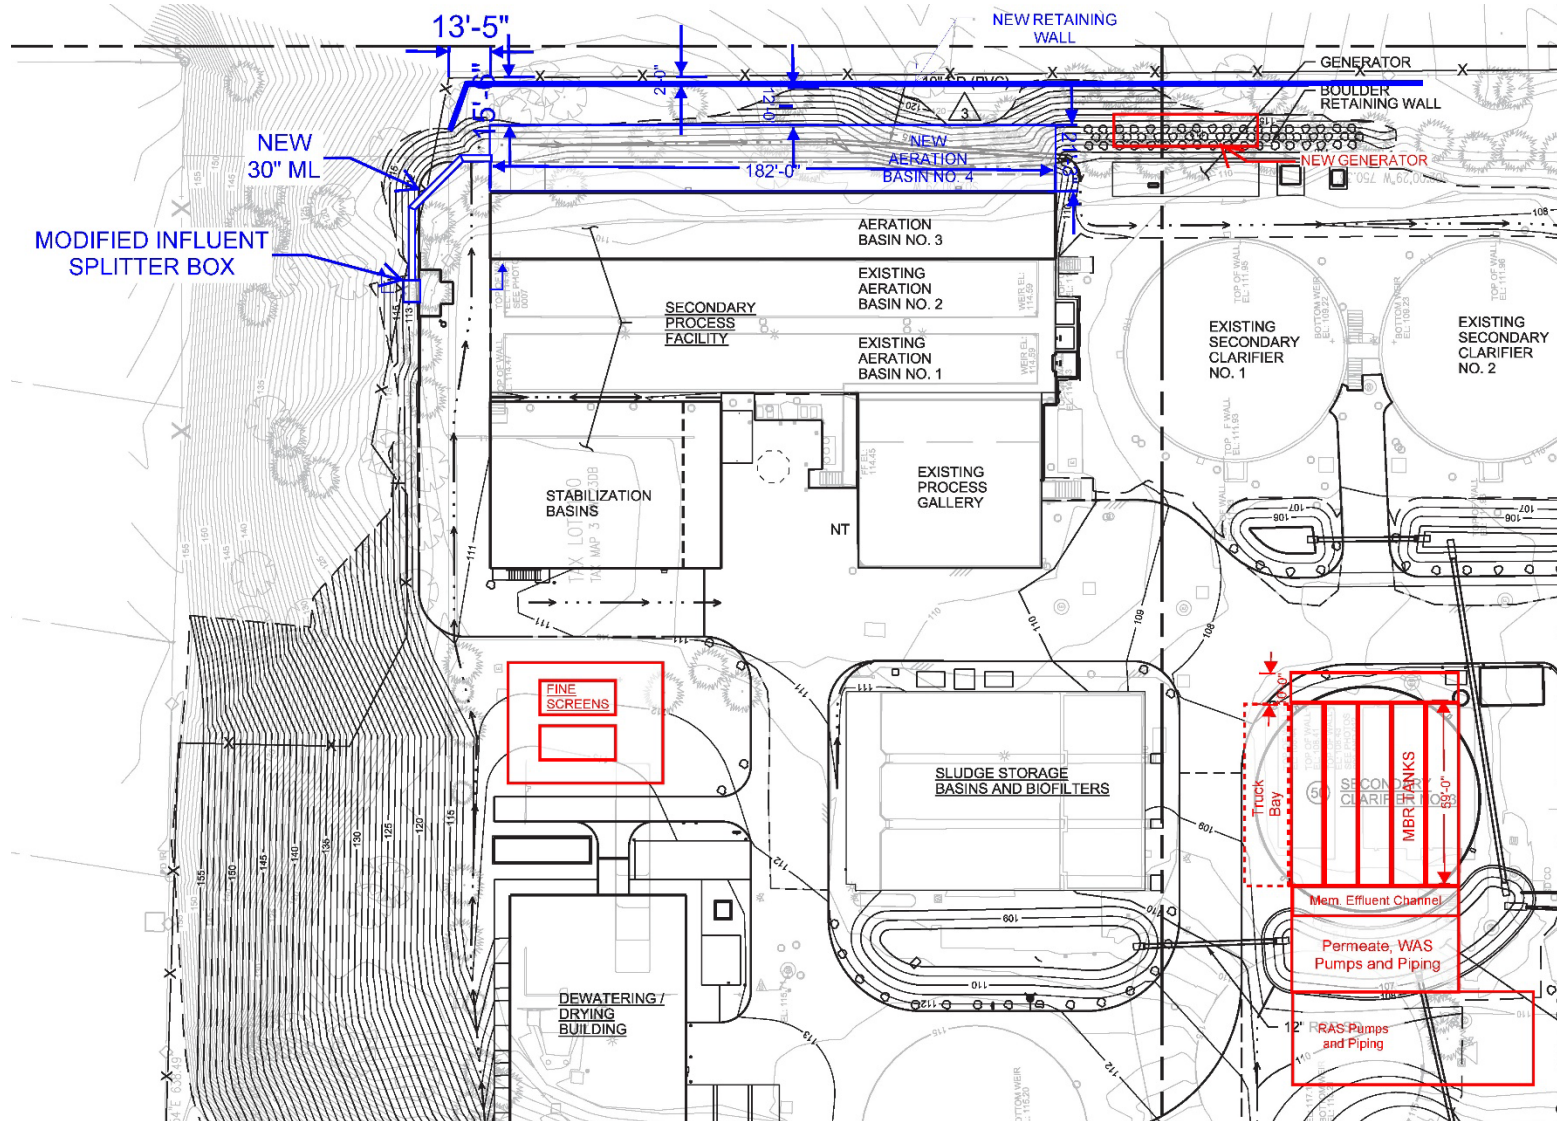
Potential MBR and Fine Screen Facility Site Plan
